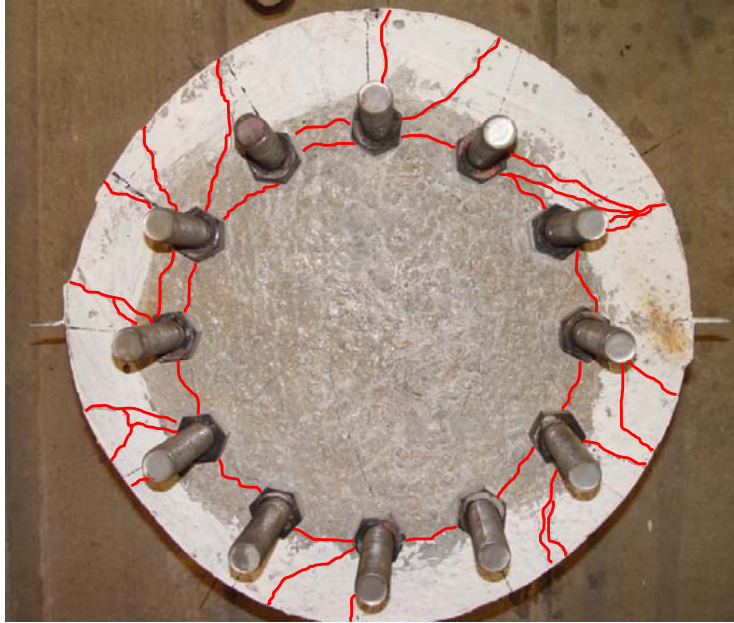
Crack pattern on face of shaft after testing depicts characteristic concrete breakout failure cracks
